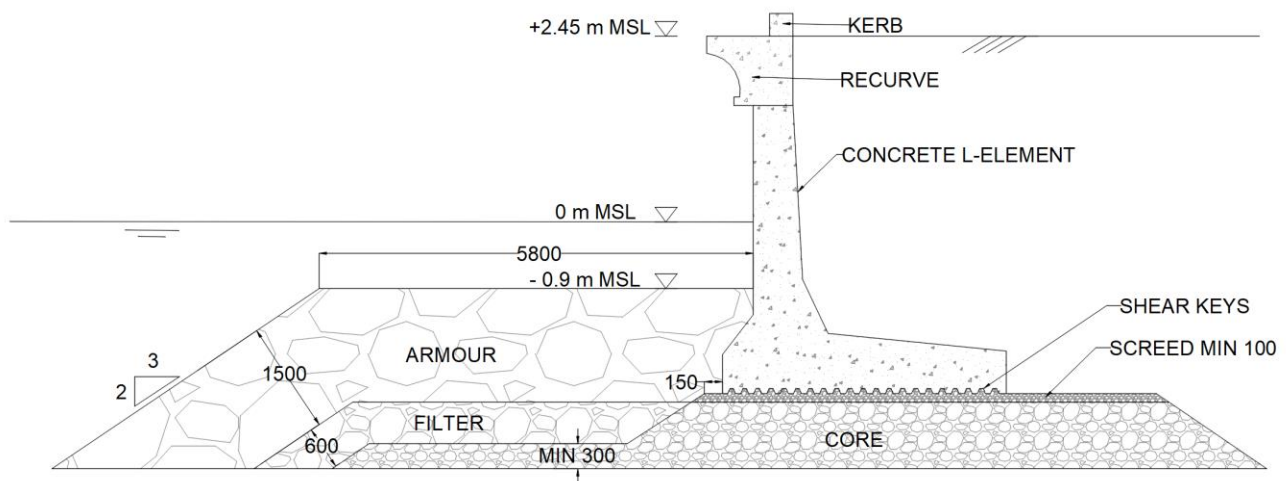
Cross-section of L-element and rubble-mound foundation design of Middle East case study (Schoonees, 2016)
